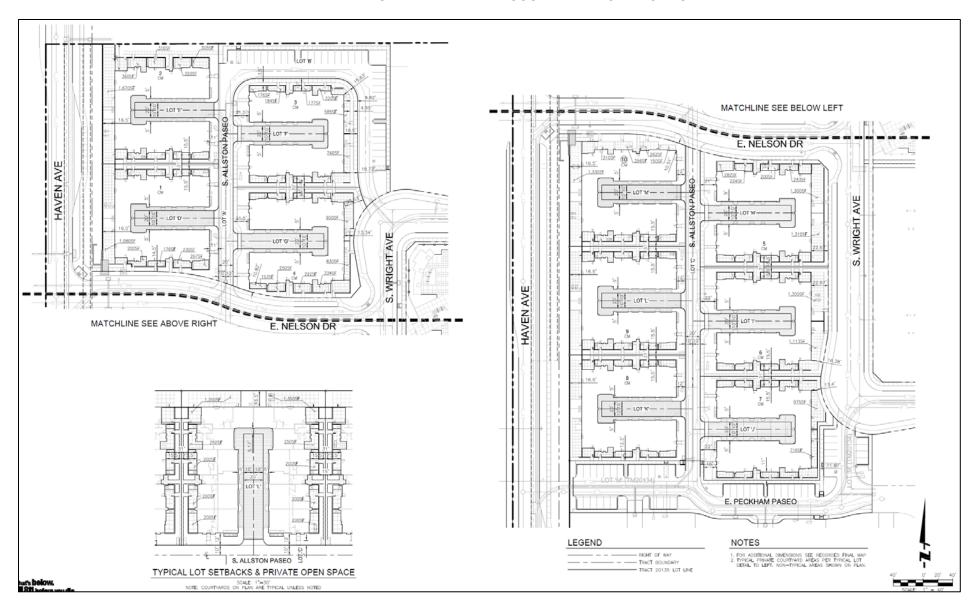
12-PLEX COURTYARD TOWNHOMES TYPICAL PLOTTING
